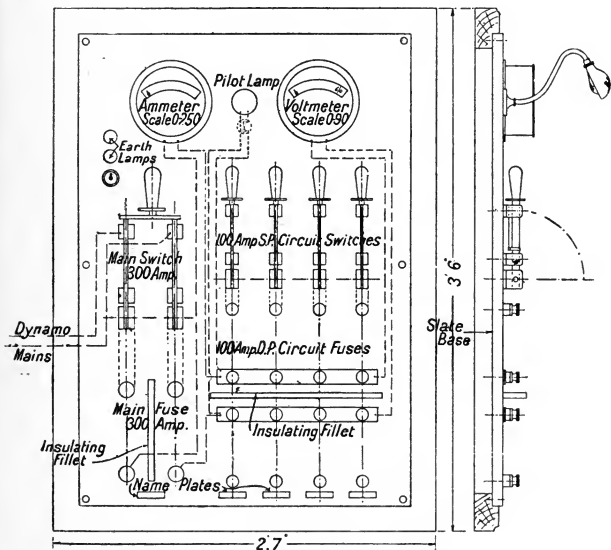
ARRANGEMENT OF SWITCHBOARD FOR DOUBLE WIRE INSTALLATION.
